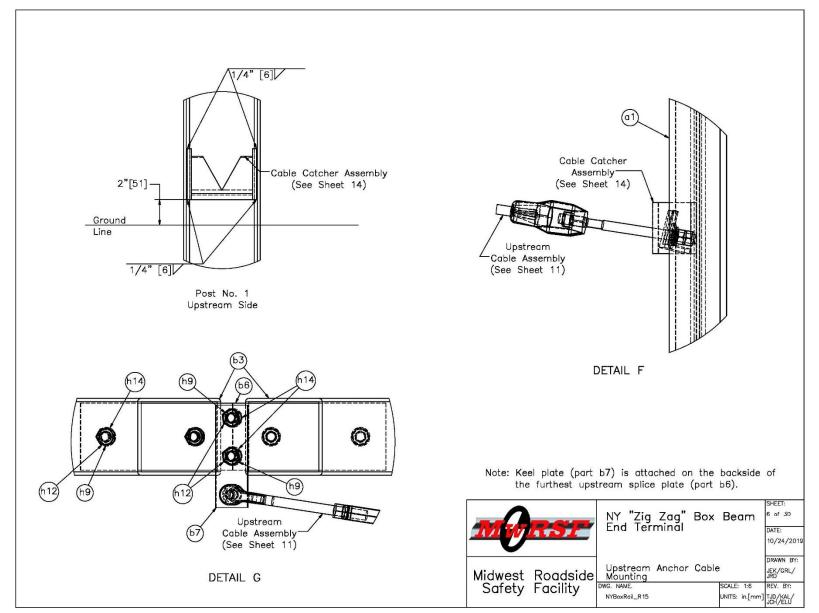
Upstream Anchor Cable Mounting, Test No. NYT-1
